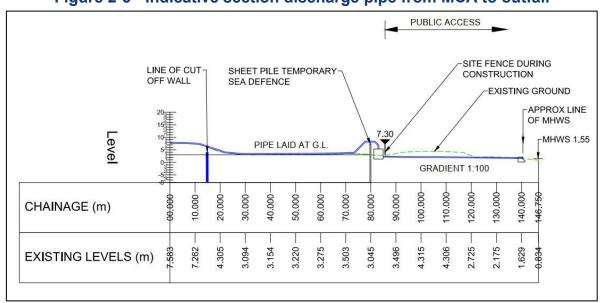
Indicative section discharge pipe from MCA to outfall
